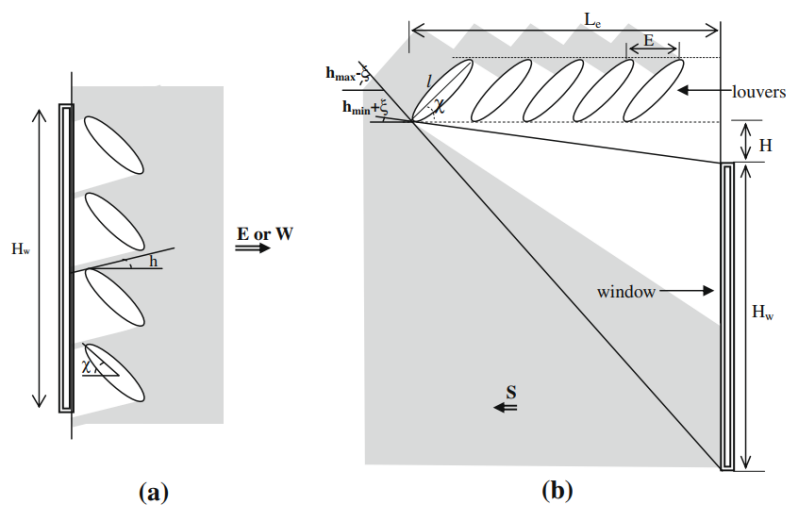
Configuration of the shading system in: (a) east or west facade and (b) south facade (Palmero-Marrero & Oliveira, 2010, p. 2042)
